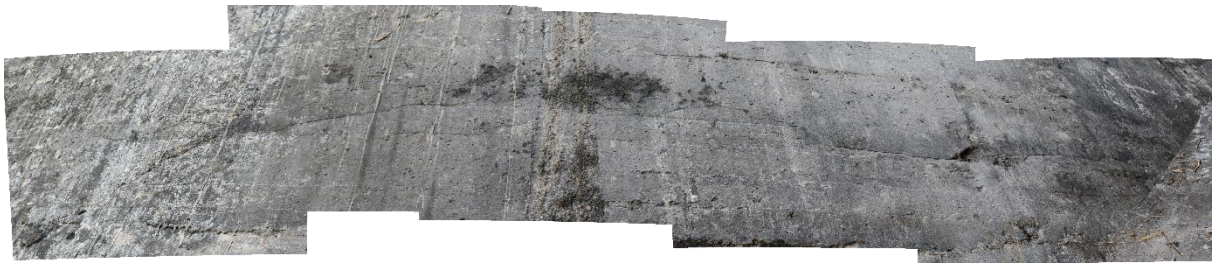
View of the horizontal crack near the dam-foundation interface, on the downstream surface of the main arch, on the left bank side, on block Q-R
